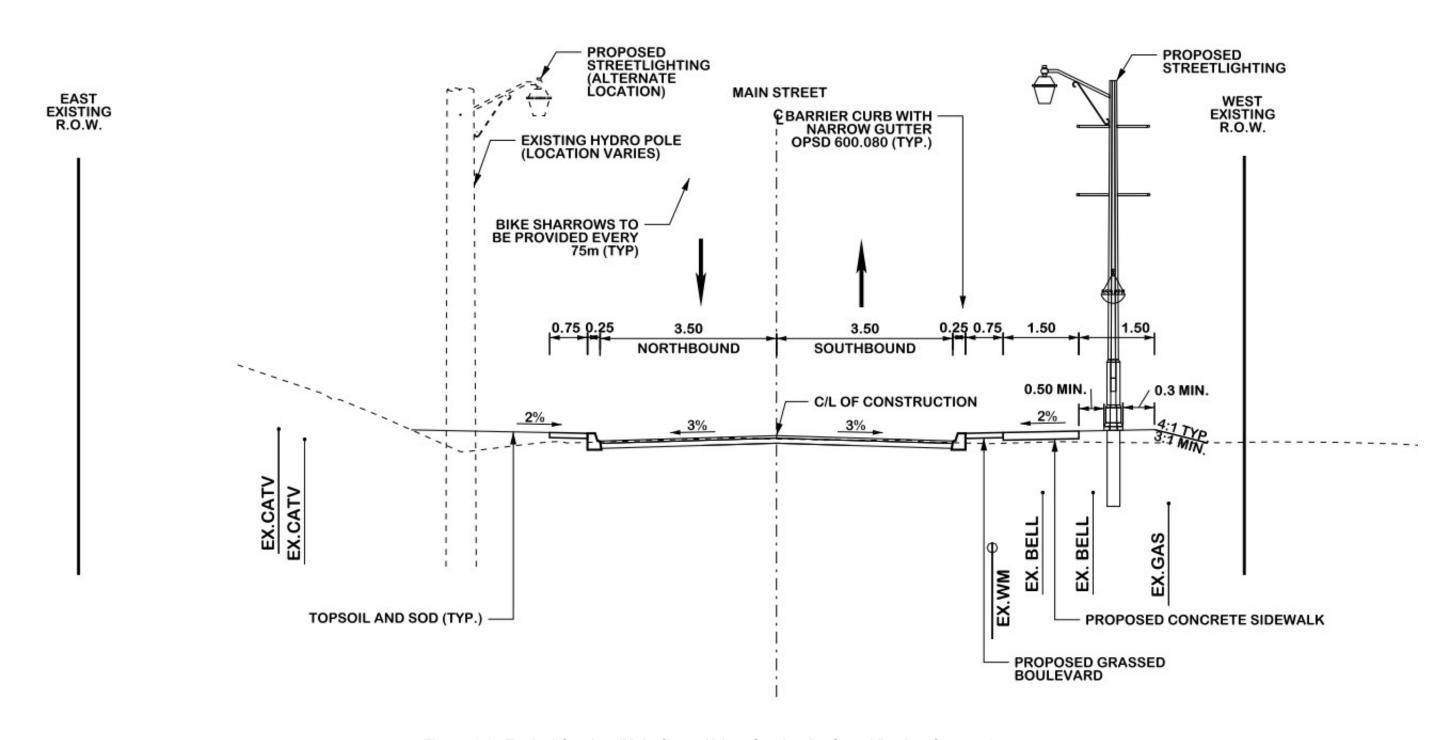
Typical Section (Main Street Urban Section Preferred Design Concept)
